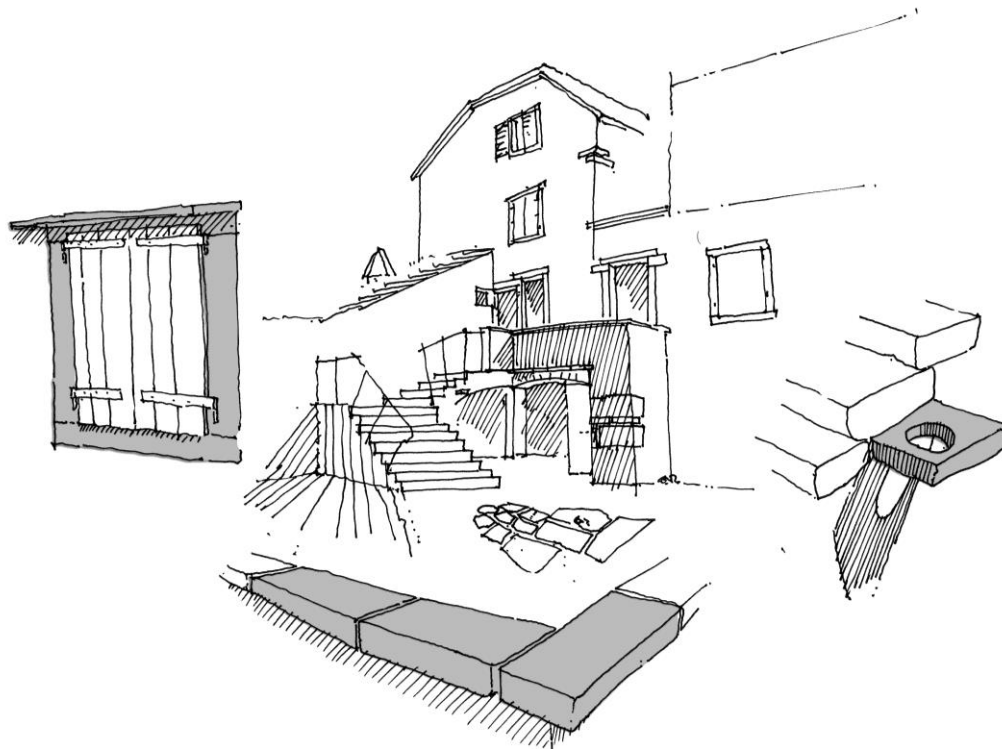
An example of interesting stone elements of stone house, Grohote, Šolta, Croatia.
